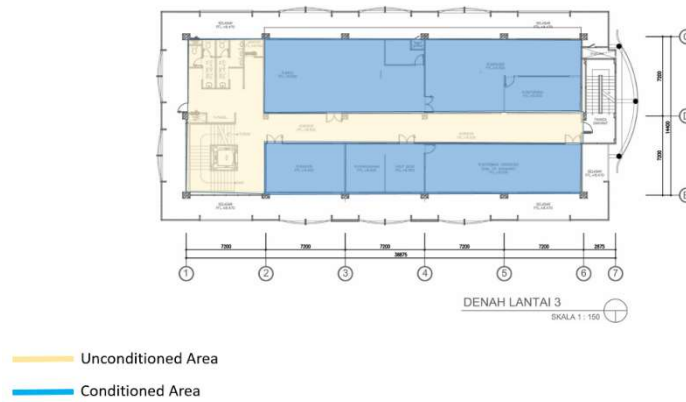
Floor Plan 3 Building B Faculty of Biology UGM.
